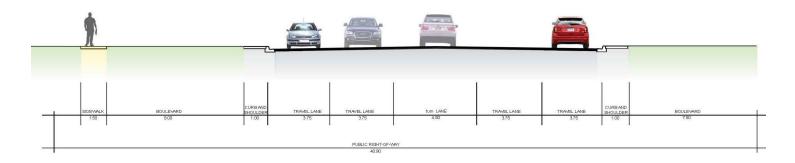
Existing Cross Section Between George Bolton Parkway and Mayfield Road
